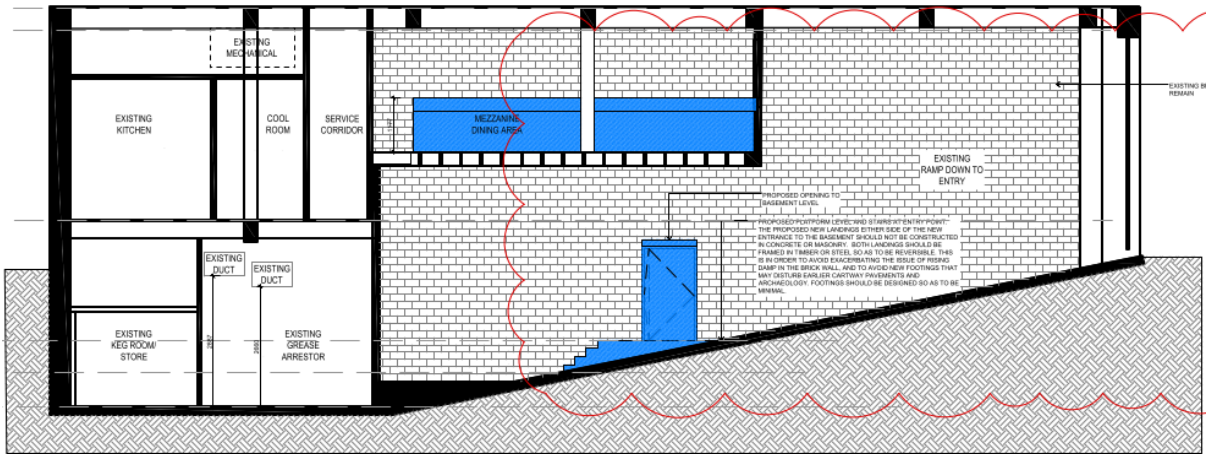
Proposed section facing south, illustrating entry down ramp into basement tenancy
